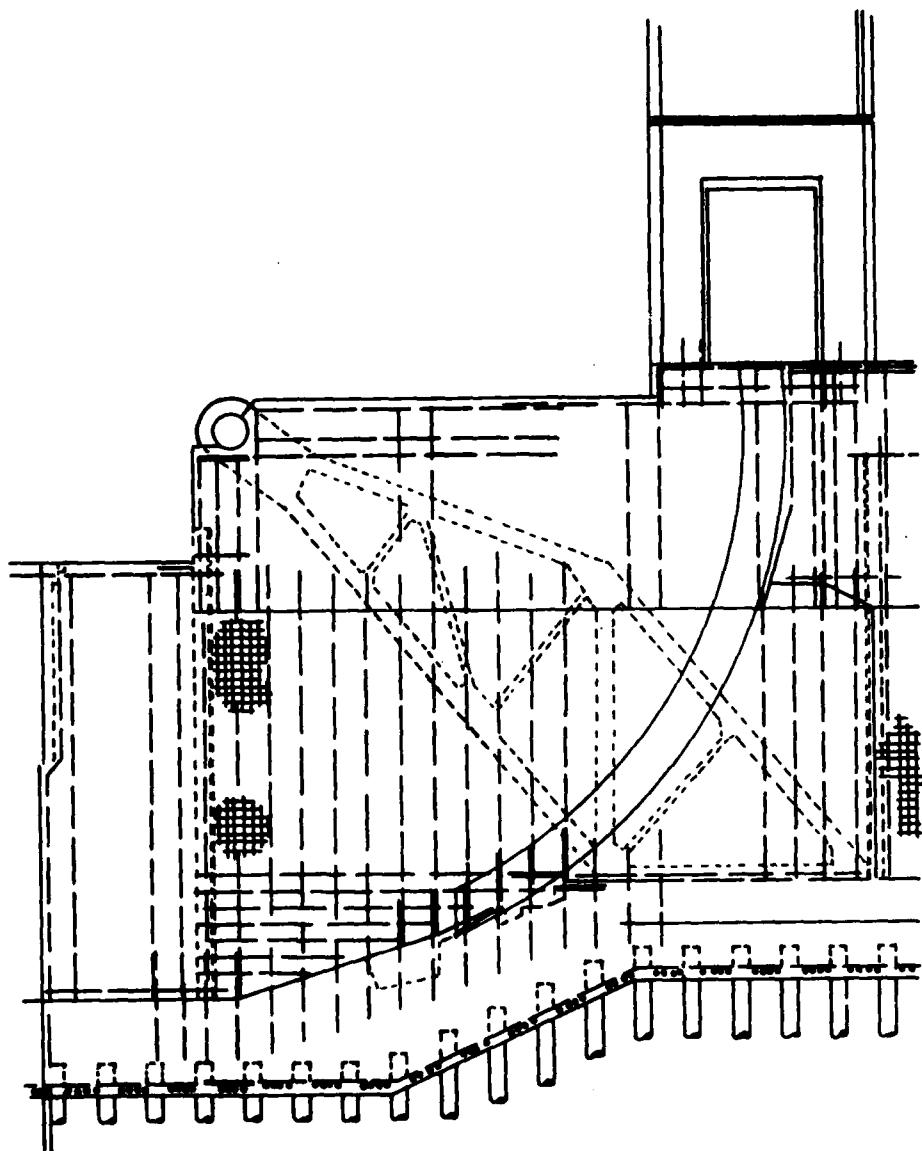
Typical pier elevation showing location of tainter gate tension anchorage
